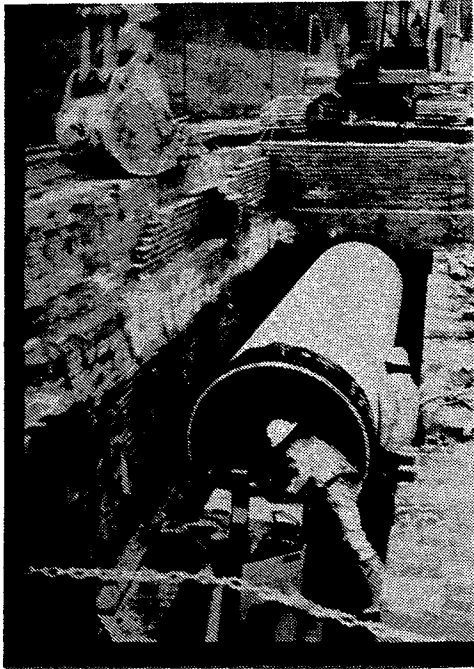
Lowering pipe sections at the Overflow Structure.
